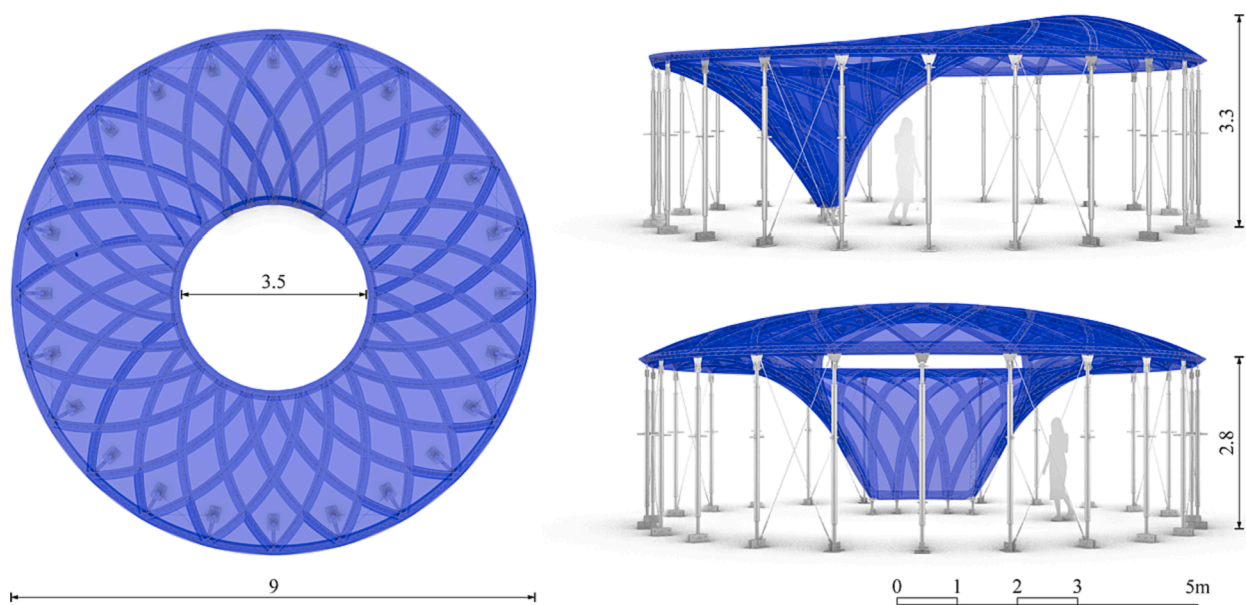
Plan, side elevation, and front elevation of the KnitNervi demonstrator with main dimensions in metres.
